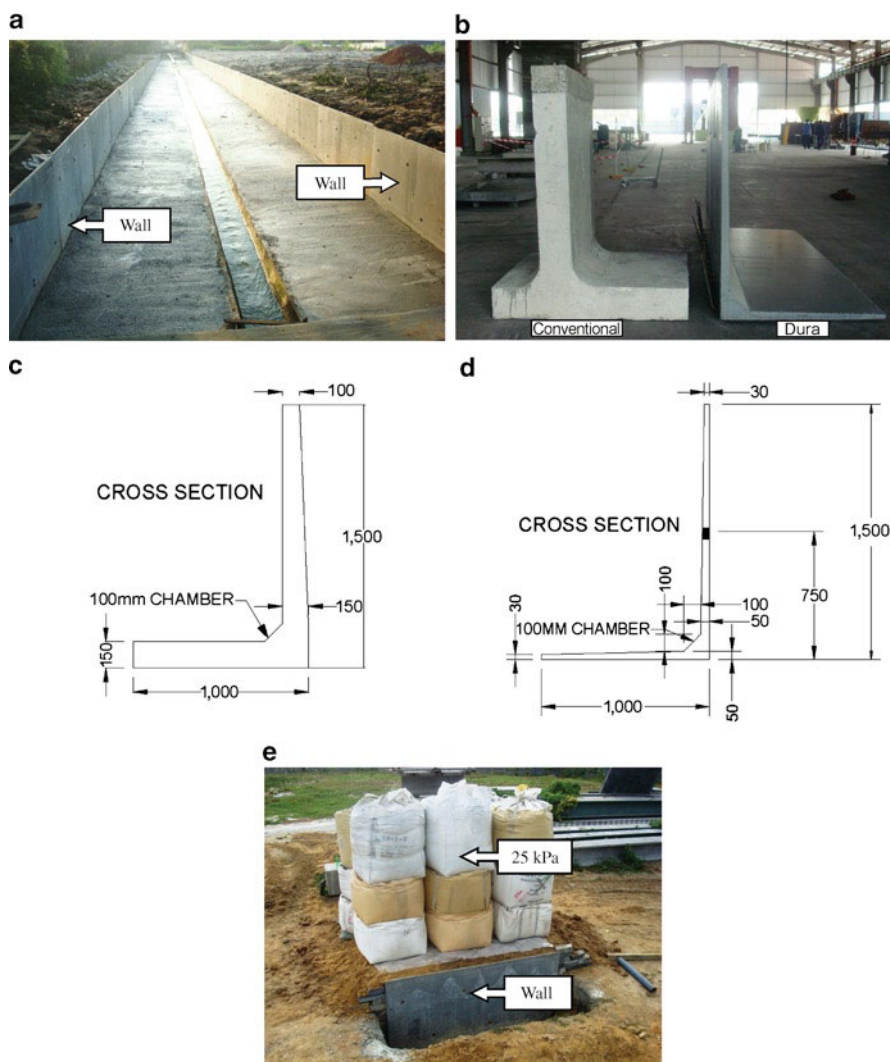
(a) 90 m long monsoon drain using RPC retaining wall in Malaysia, (b) comparison of conventional precast L-shape retaining wall against RPC light weight retaining wall, (c) cross sectional details for conventional precast L-shape retaining wall, (d) cross sectional details for RPC retaining wall, and (e) load proof test of the RPC wall back filled and with a 25 kPa surcharge load
